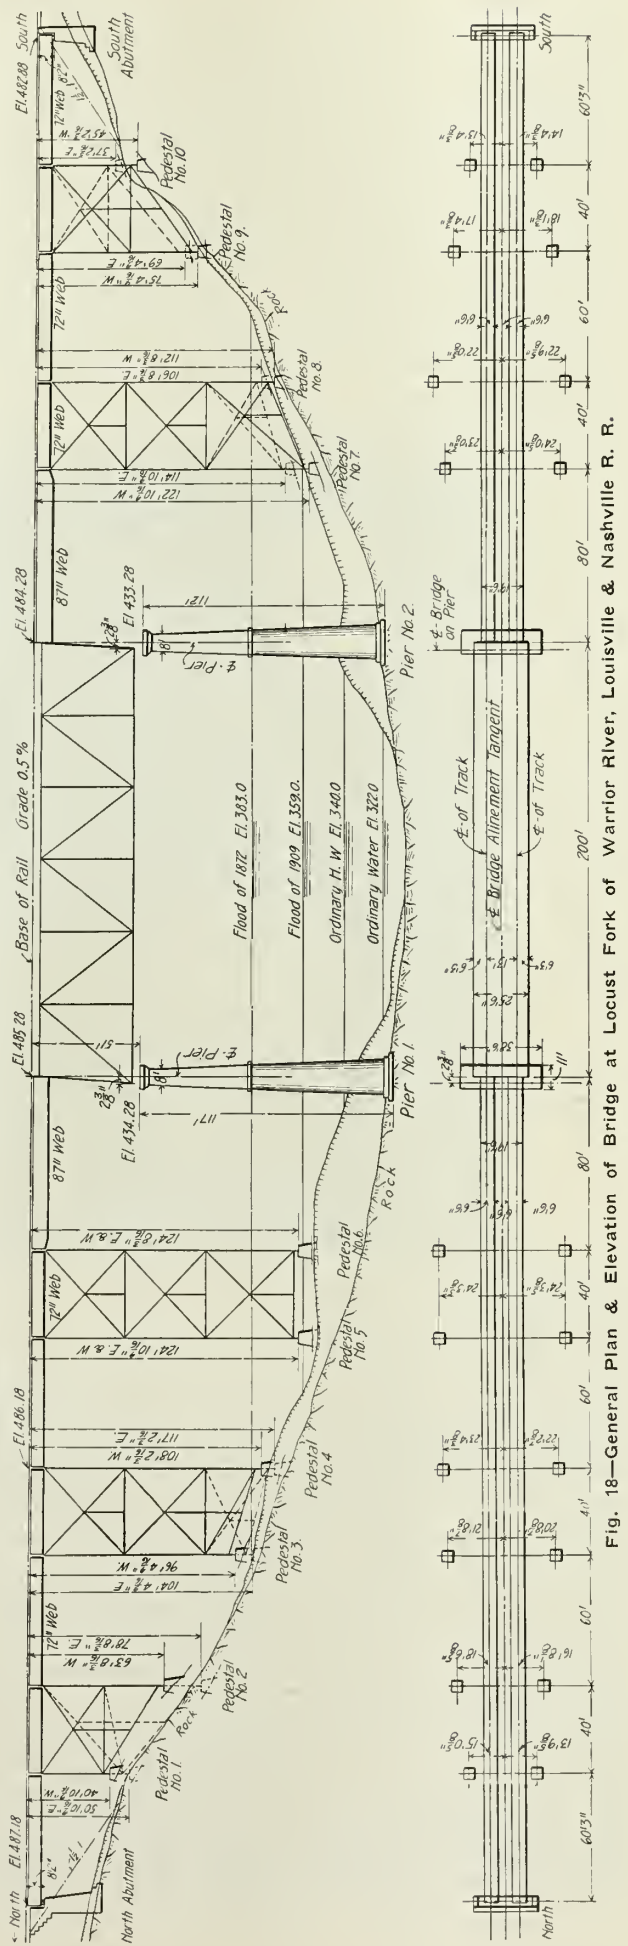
General Plan & Elevation of Bridge at Locust Fork of Warrior River, Louisville & Nashville R. R.
